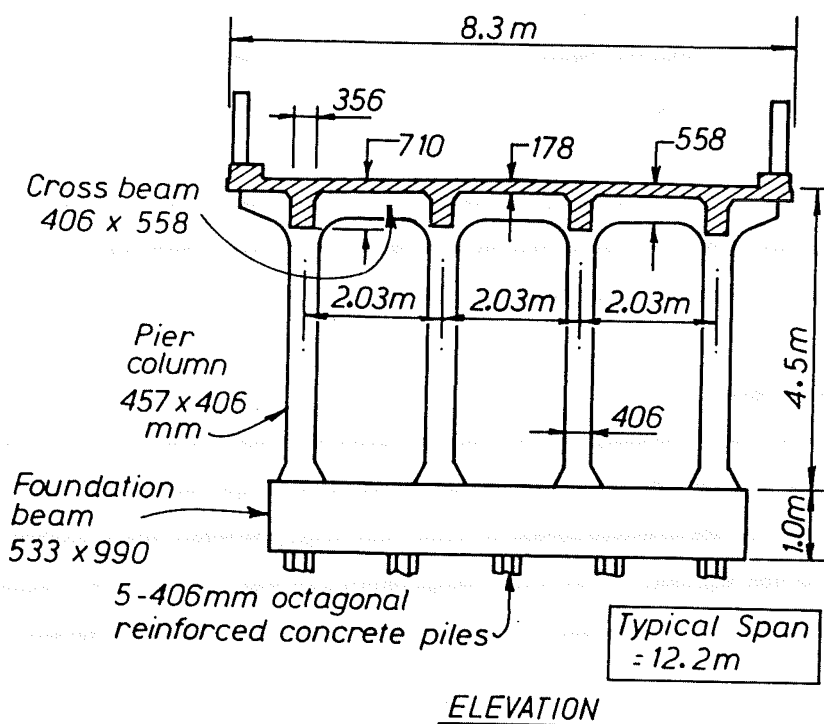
Cross-section of the prototype bridge [Chapman 1991].
